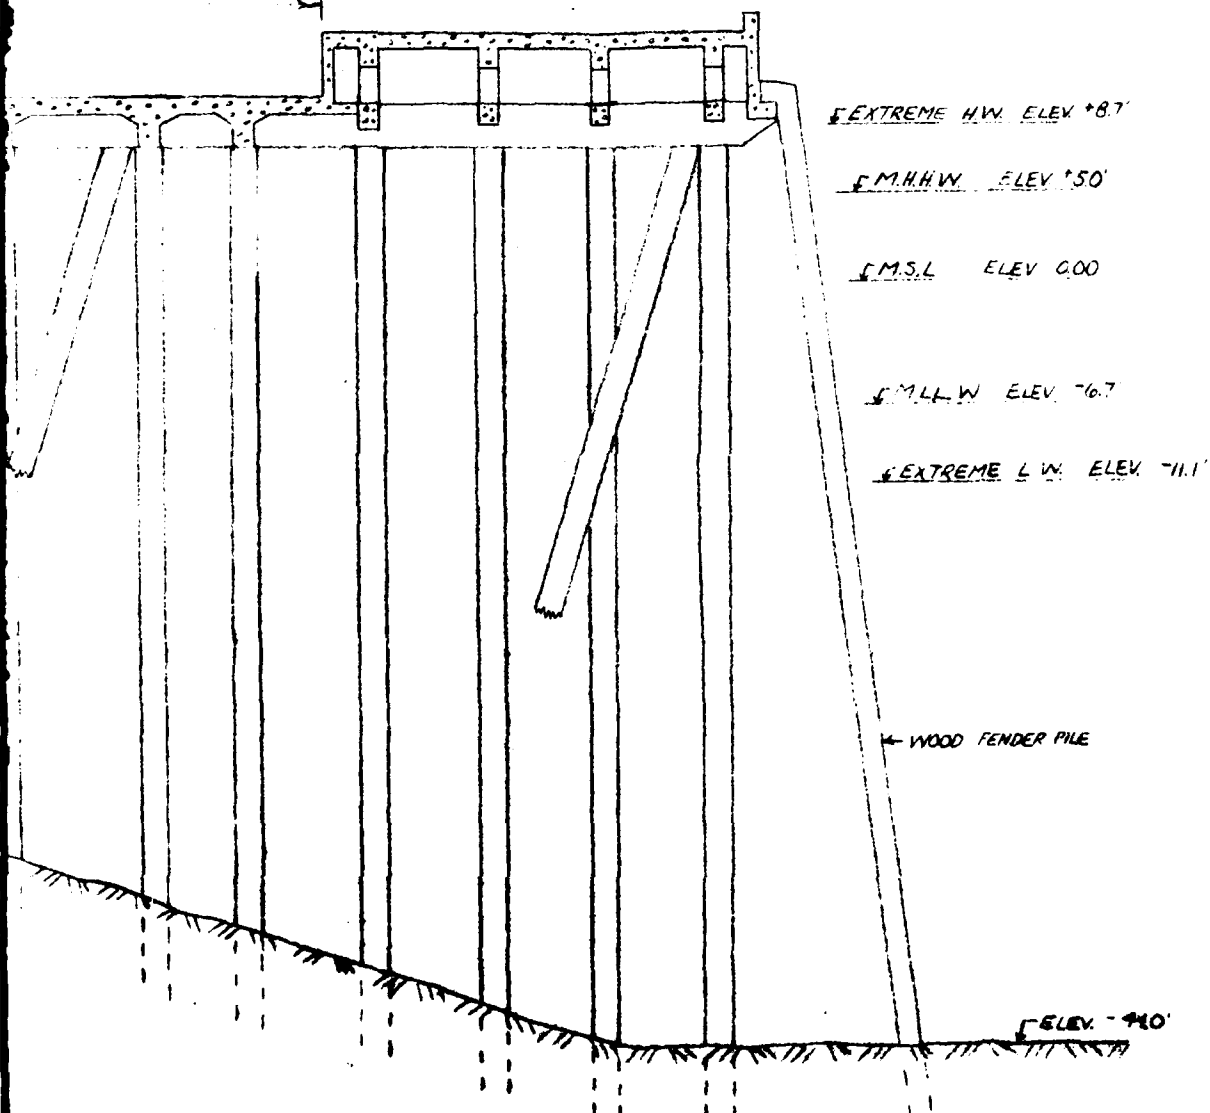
TYPICAL WHARF CROSS SECTION - NORTH LEG
